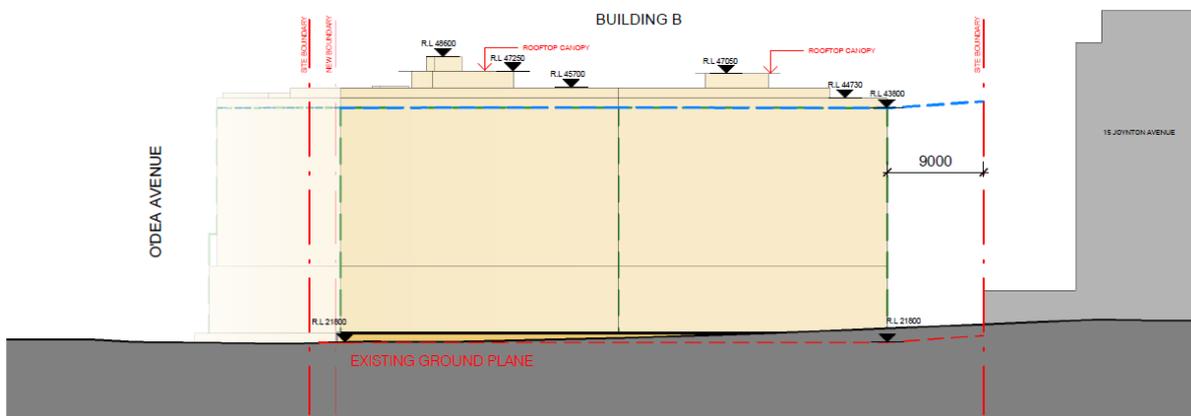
Kingsborough Way elevation of approved concept building envelope – 22m height limit illustrated by blue dashed lines
